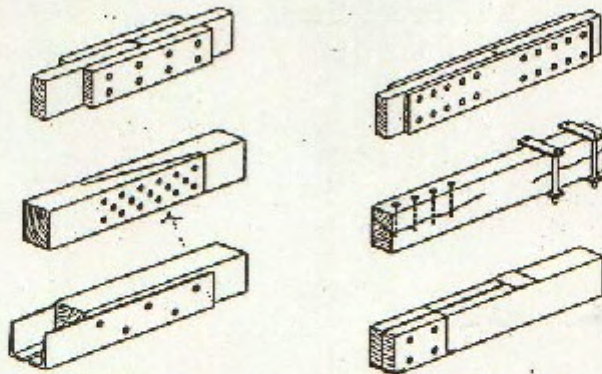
Replacement of inefficient segments of original members by means of traditional joints; left, top to bottom: splice joint covered by bolted wooden plates, nailed spliced bevelled joint, bolted end joint, with steel channel; right, top to bottom: splice joint covered by bolted steel plates, shear reinforcement with nails or steel clamps, splice joint with internal steel plate.
